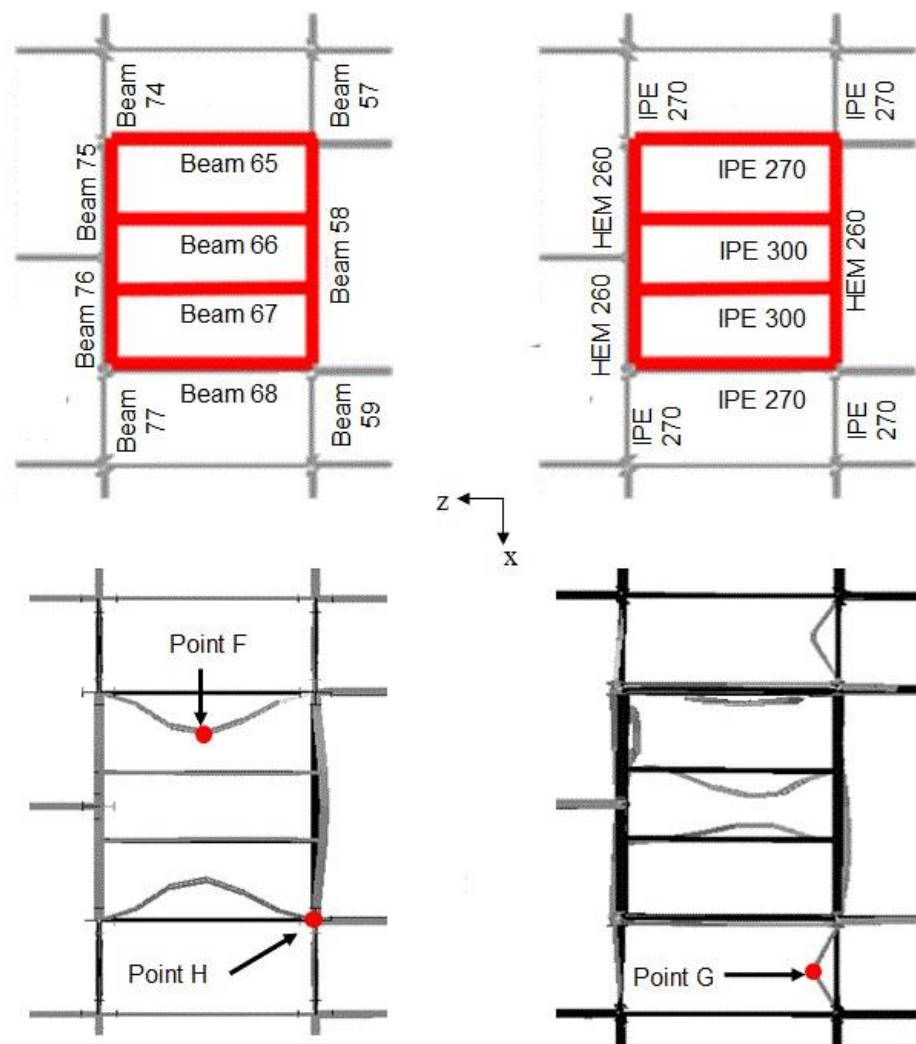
Deformed shape of the 5th floor (left column) and of the 35th floor (right column) in case of fire scenario 2
